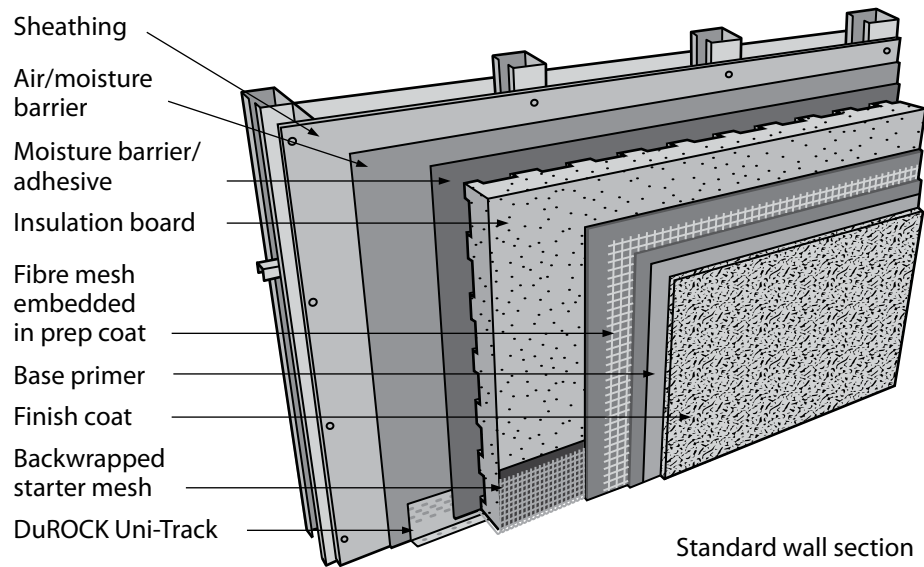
EIFS wall cladding showing grooved rigid insulation providing a drainage cavity
